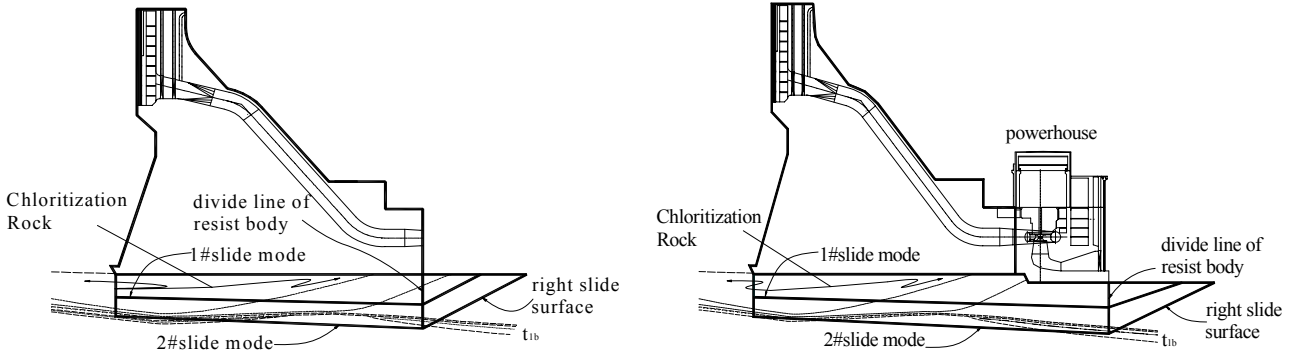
Slide modes of dam bedrock under both forms between dam and plant
